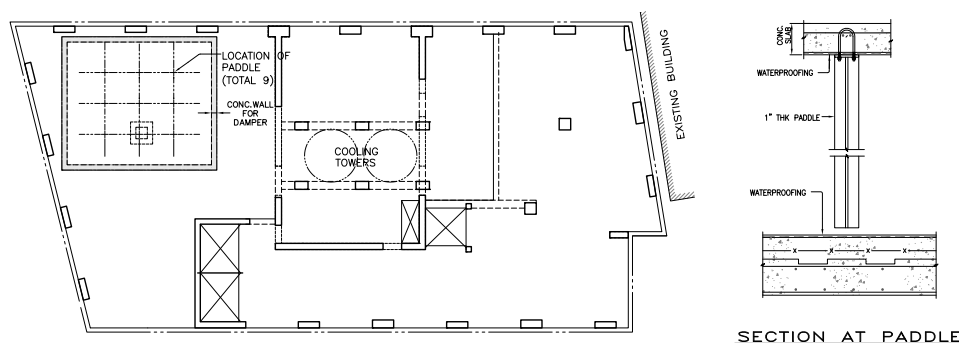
TSD location plan and section (W Downtown Hotel -56th floor).
